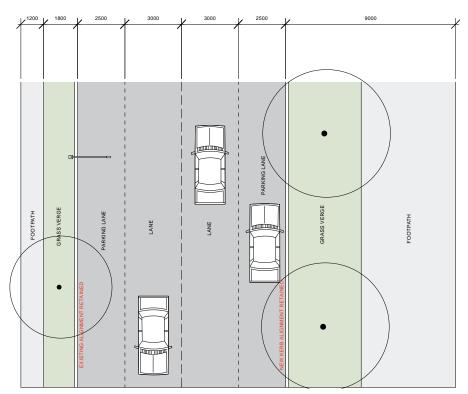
TYPICAL STREET SECTION THROUGH SOUTH JOHN PARADE SCALE 1:200
